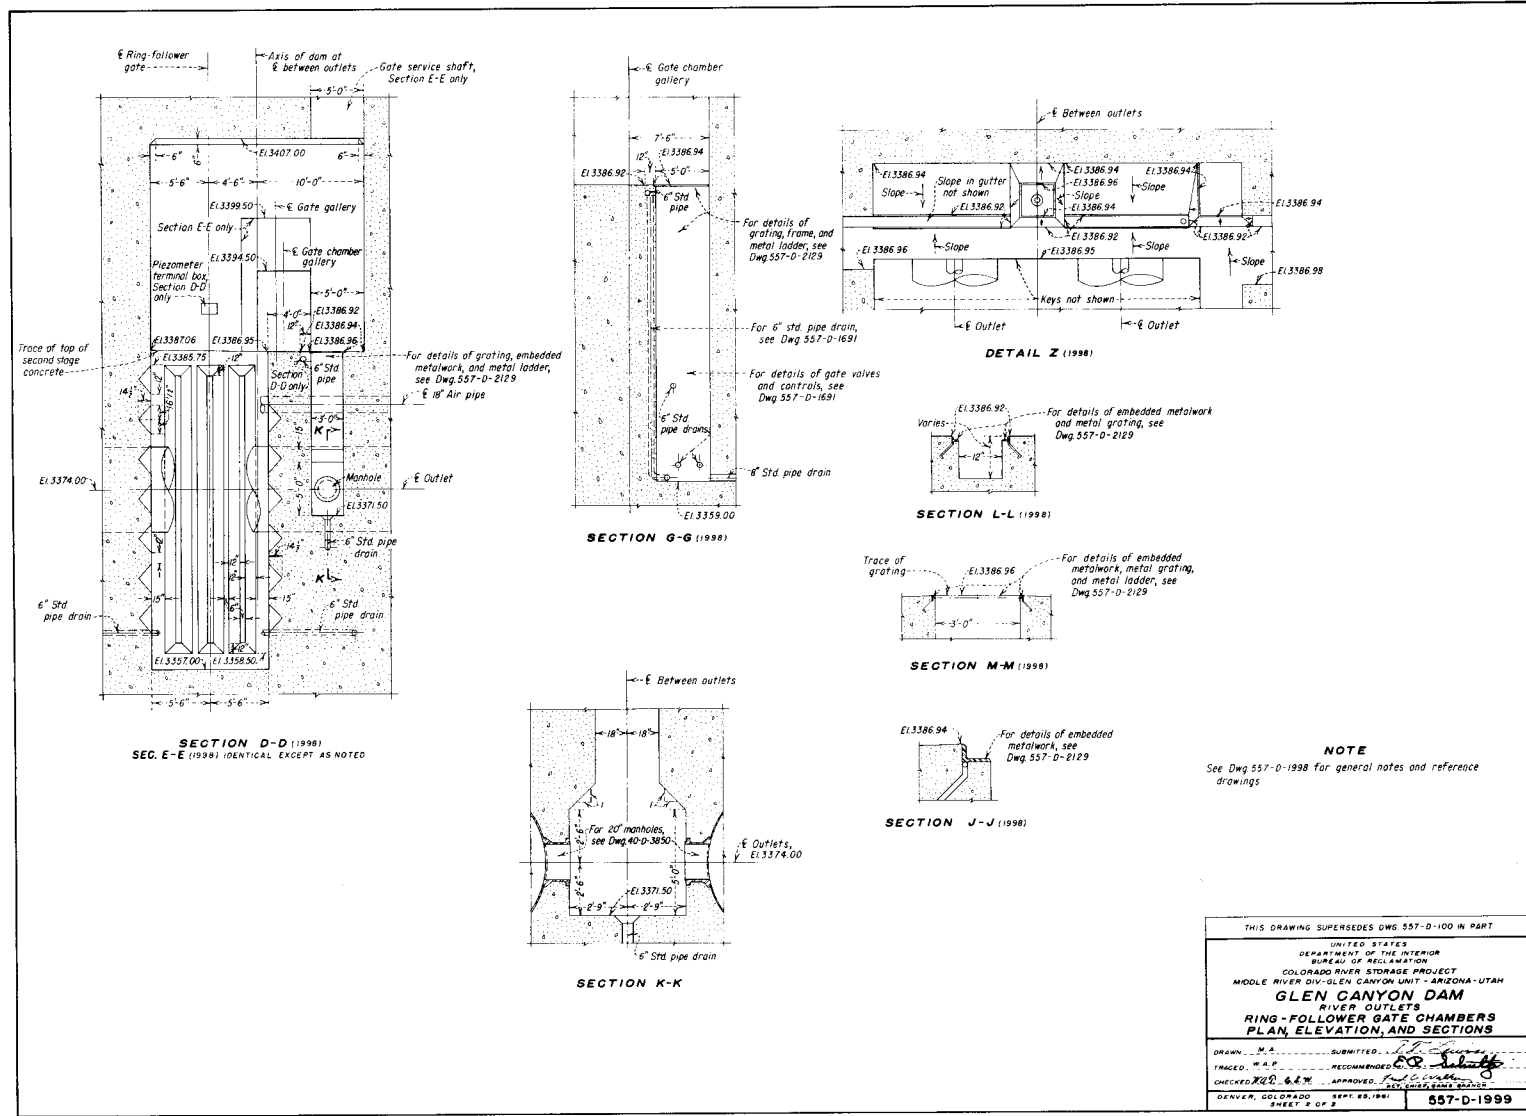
River outlets, ring-follower gate chambers—Plan, elevation, and sections. (Sheet 2 of 2.)
